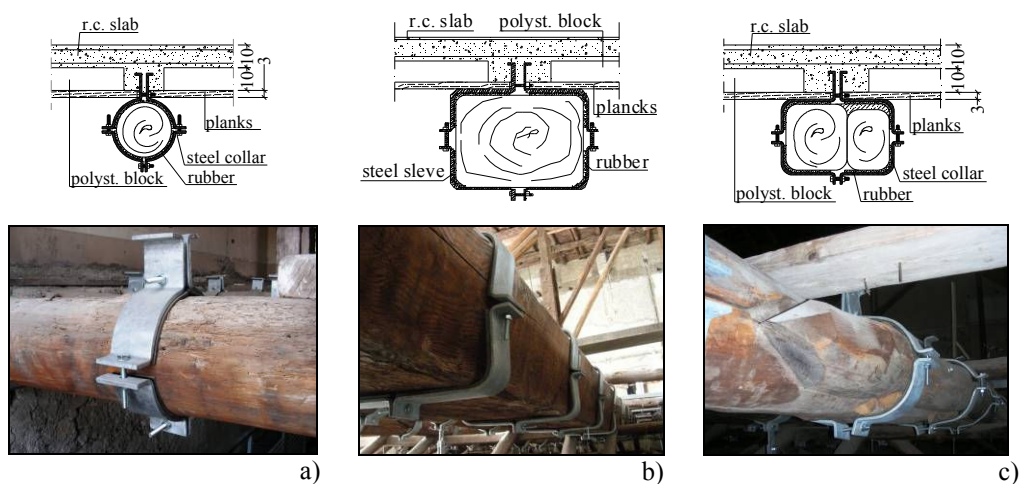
Diplomatic Hall (II) – Retrofitting interventions – Beam-slab connectors:
